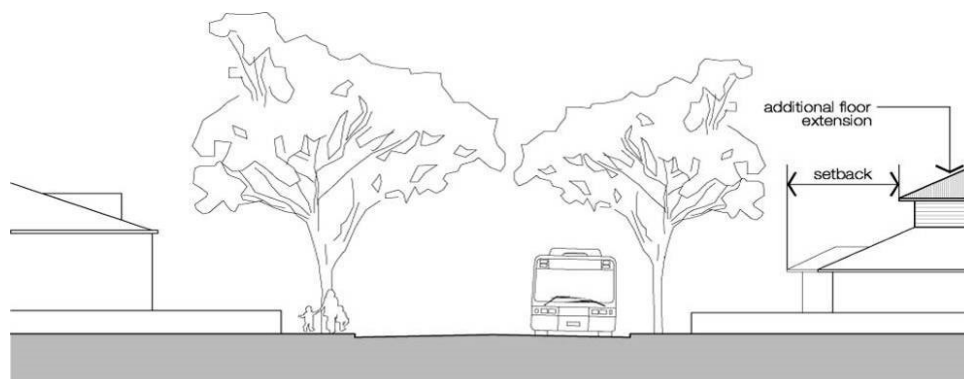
An example of alterations and additions which are sensitively undertaken. First floor additions are set back in order to minimise the impact upon the street character.
